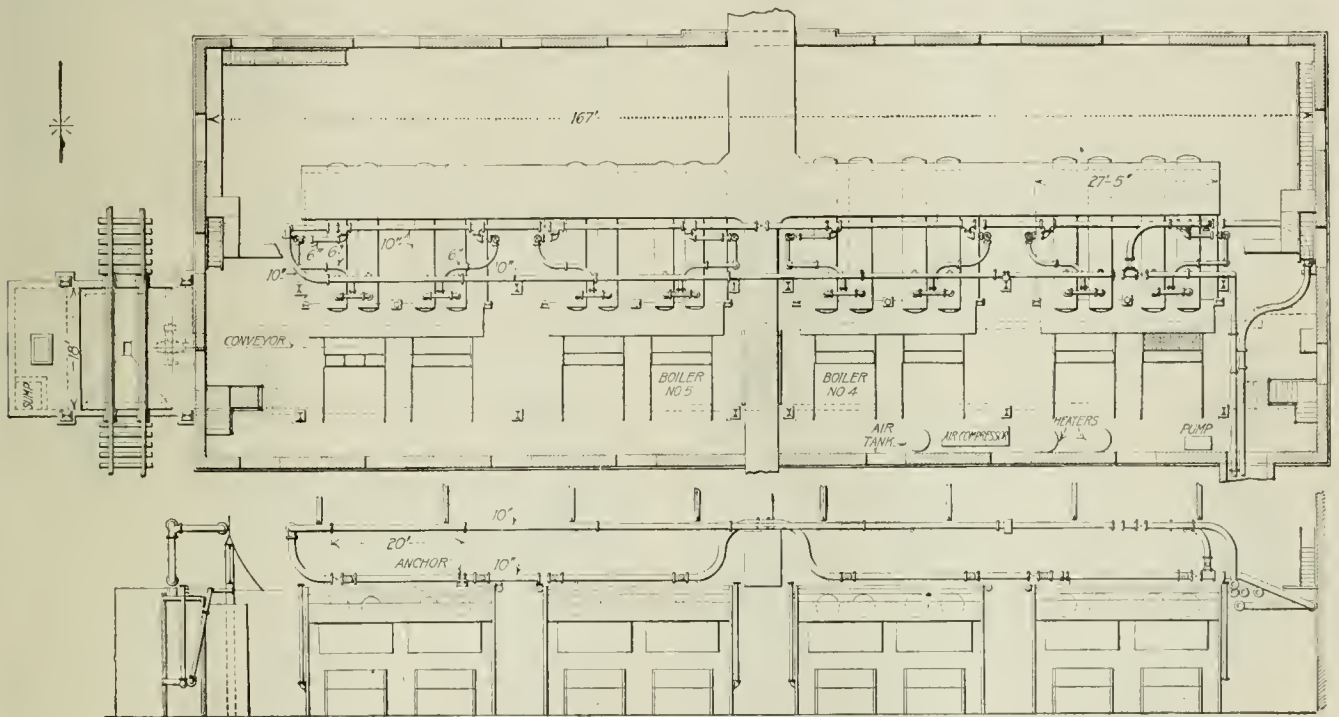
PLAN AND ELEVATION OF THE NEW BADEN STATION BOILER ROOM
